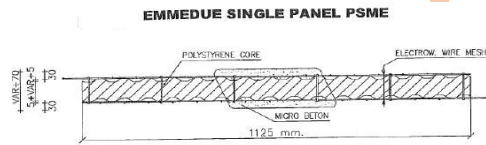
Emedue Single Panel PSM80 Details (Ref. 1, p.7)
